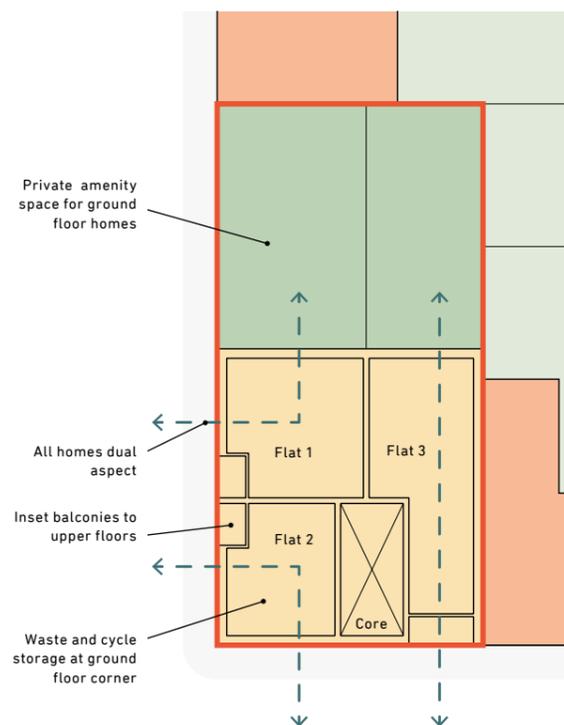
Potential upper floor plan of corner infill development to achieve dual-aspect homes
